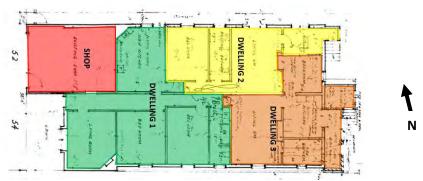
BR-133A/1968 plans, showing three dwellings and one commercial space.
